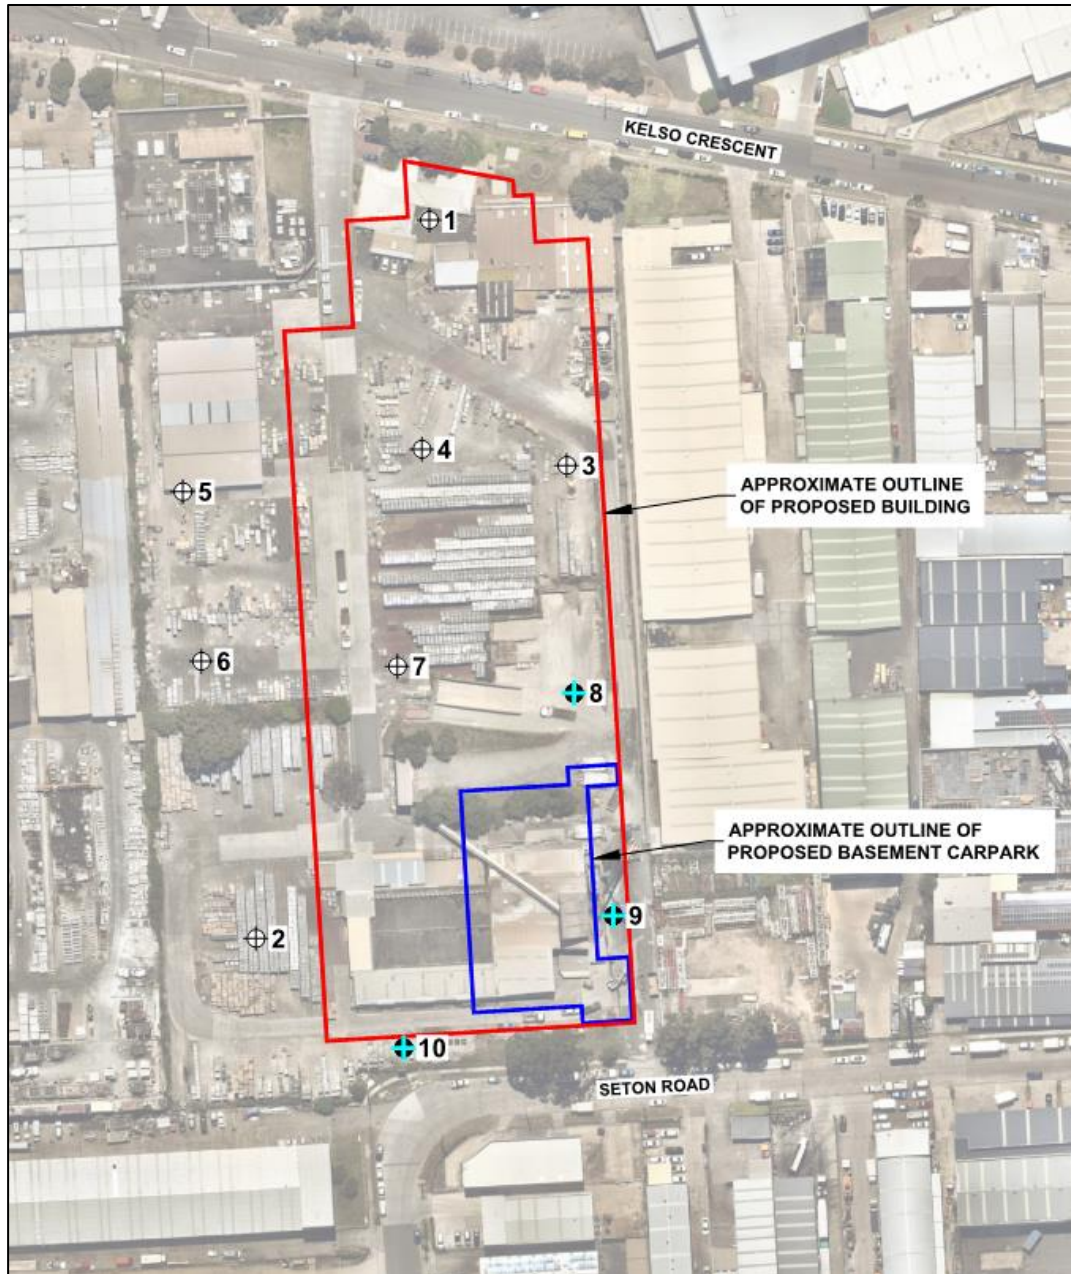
Borehole Location Plan (Source: JK Geotechnical, 2024)
